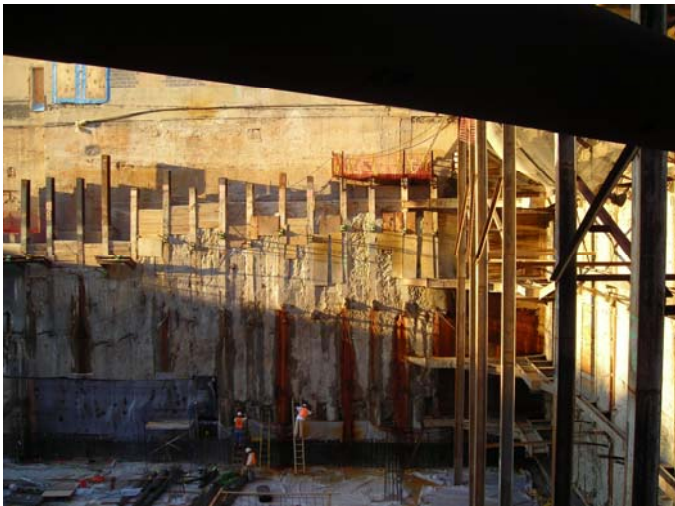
Tangent Wall Scabbled Back to Face of Soldier Beams and Waterproofing Being Installed
